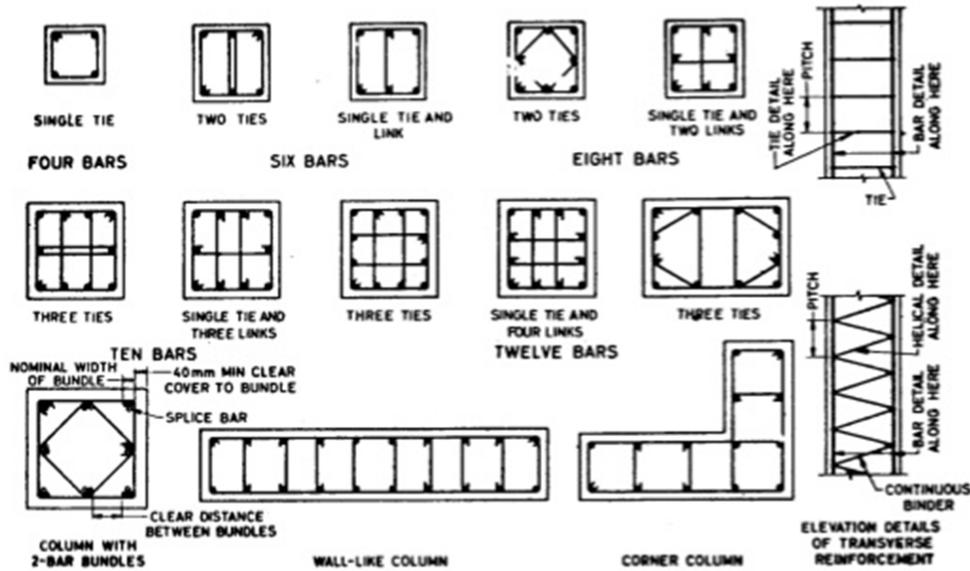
TYPICAL ARRANGEMENT OF LATERAL TIES AND LINKS IN COLUMNS
